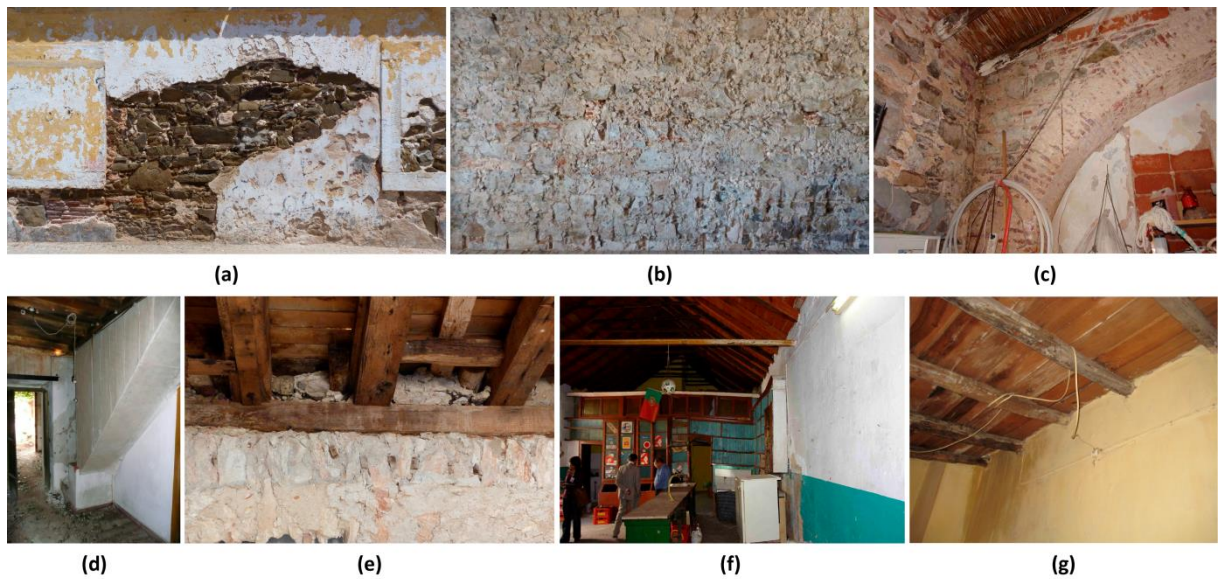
Typical construction characteristics of VRSA buildings: (a-b) stone masonry morphology; (c) timber roof connection with stone masonry walls (SGU 2008) (d) timber floor construction (SGU 2008); (e) timber floor connection with masonry walls; (f-g) roof timber construction and connection with masonry walls (SGU 2008)
